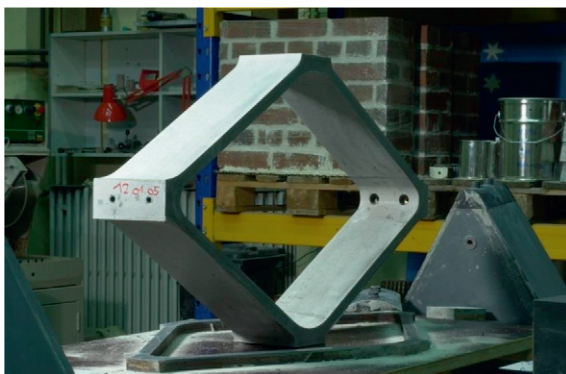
Manufacturing the mold and placing the textile reinforcement.
